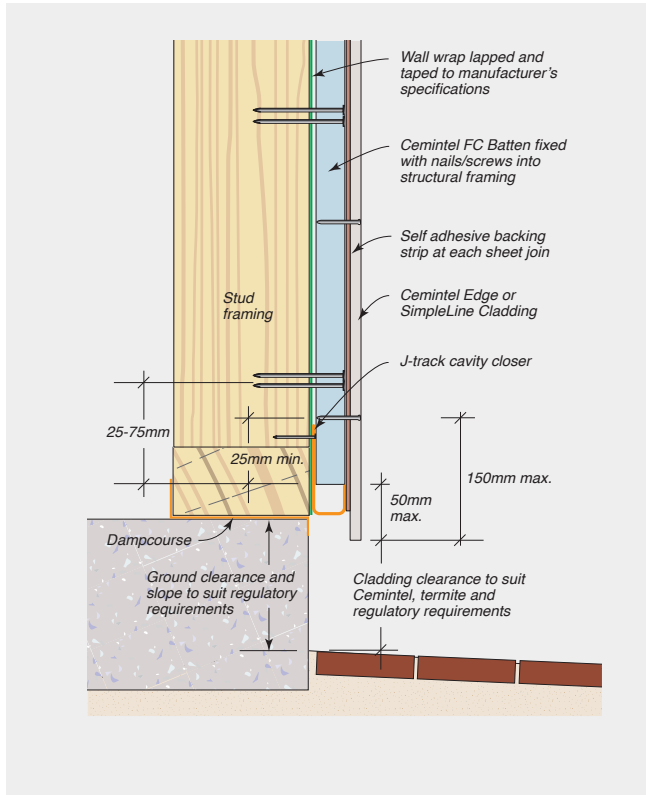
Base – Pier or Stub Wall Foundation
